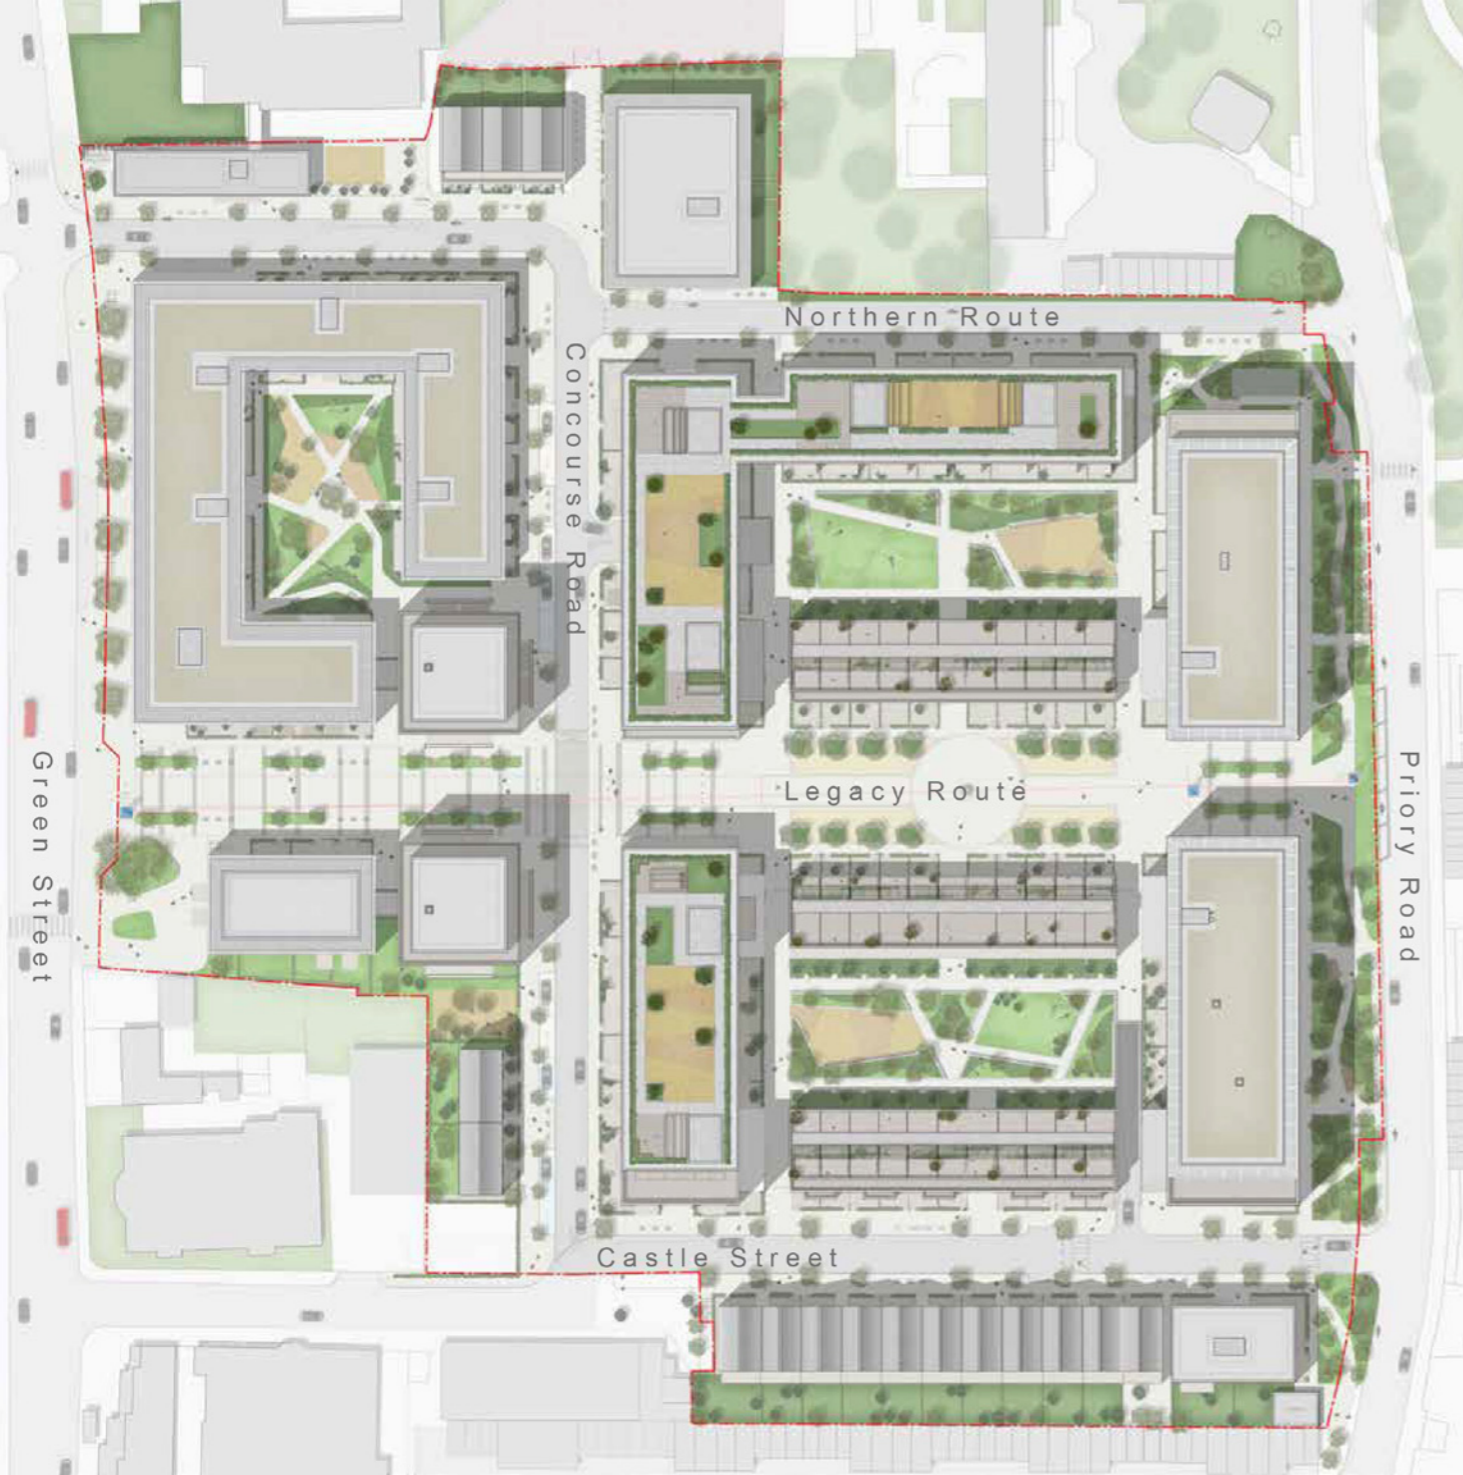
Site plan of Barratt London's Upton Gardens development (opposite)
